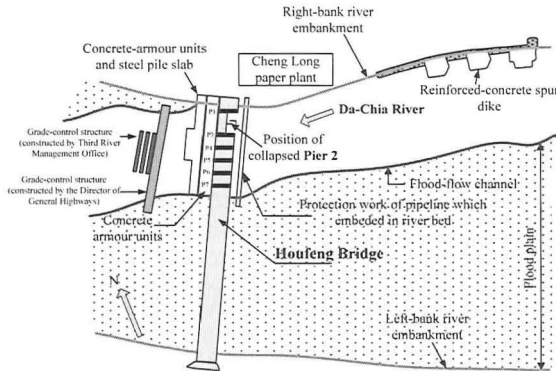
Schematic site plan of the Houfeng Bridge near-field at failure
